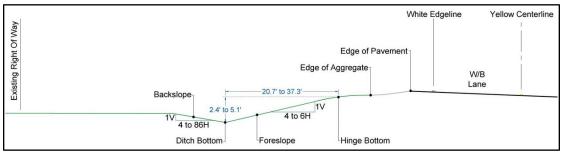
Typical section of the drainage channel (Station 1+00 to Station 21+00).
